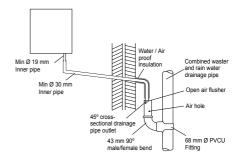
Outside Connection of Condensate Water Drainage Pipe
